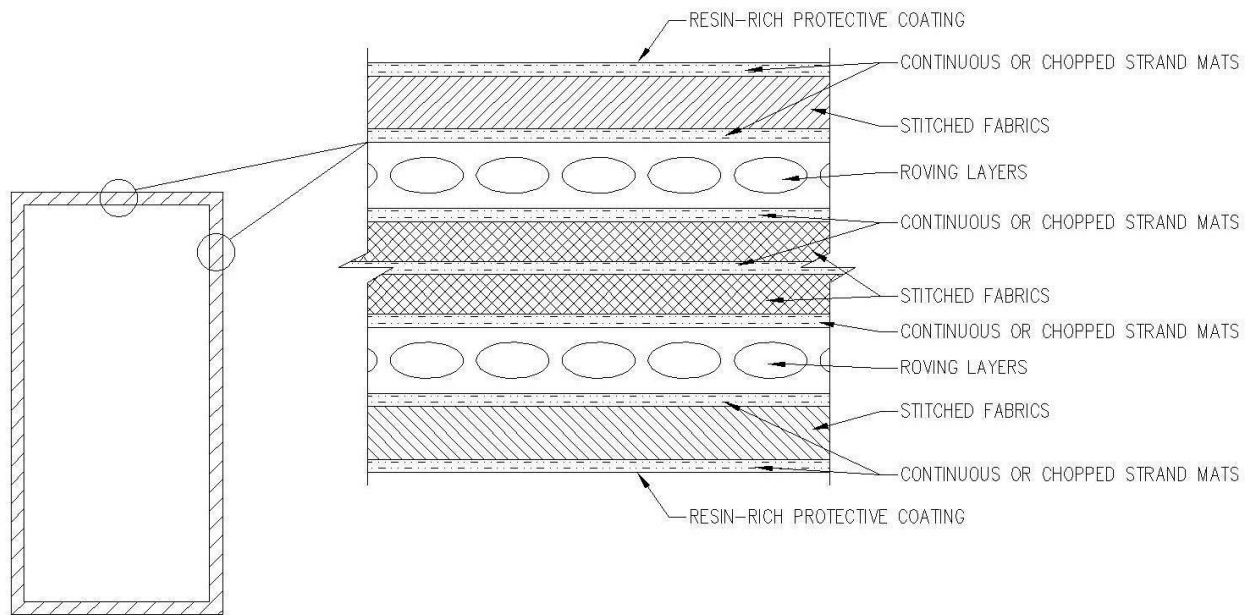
Typical Layer Arrangement of FRP Pultruded Structural Shapes.
